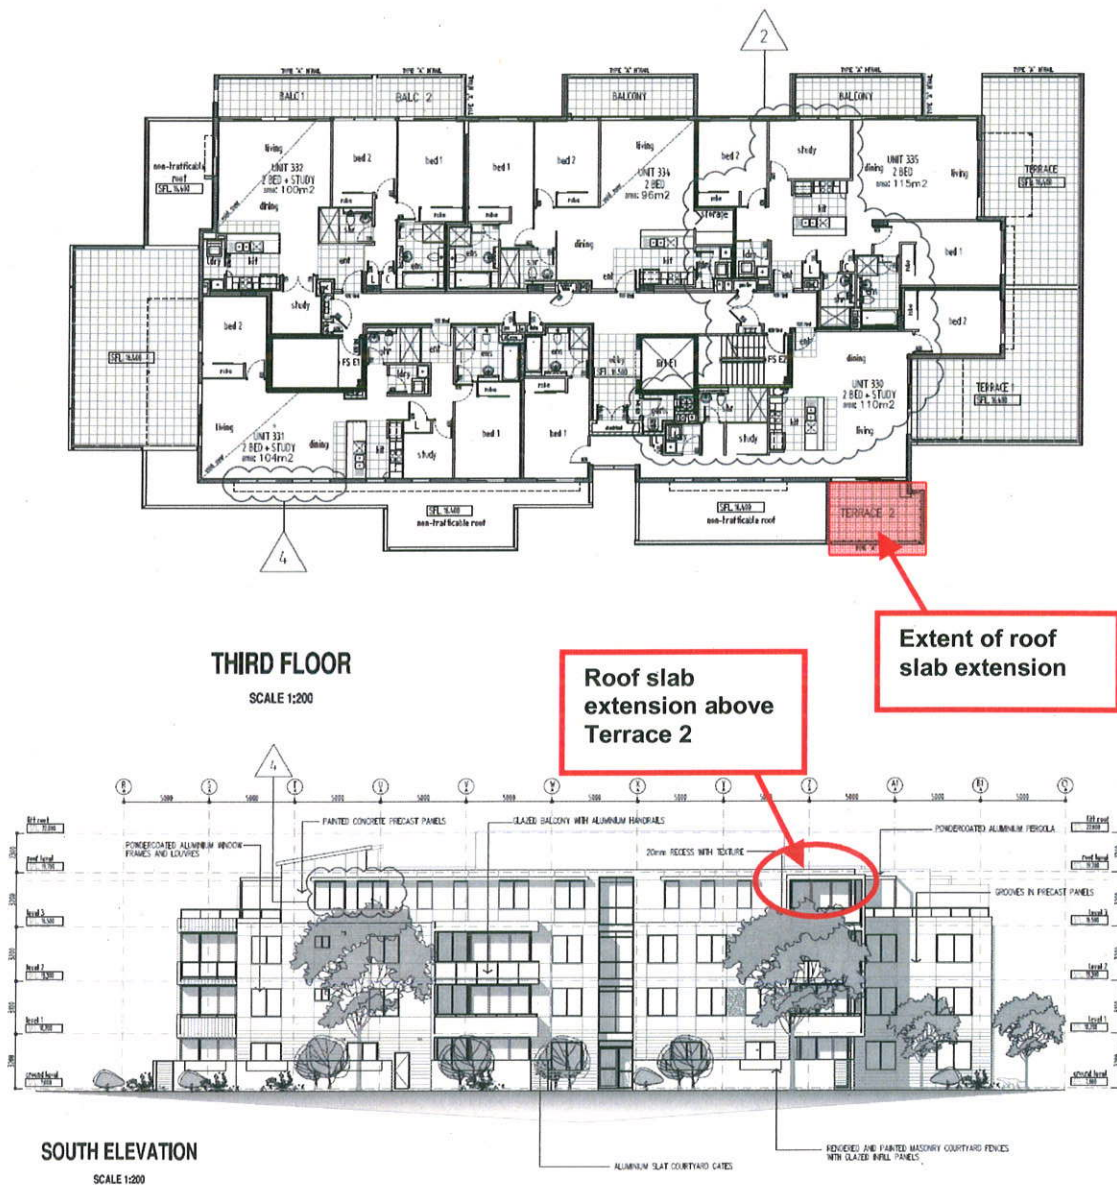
The extent and location of the proposed roof slab to Building E in plan and elevation
